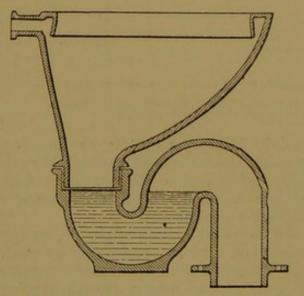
WASH-OUT CLOSET WITH SYPHON TRAP. (From Newsholme's "School Hygiene.")
